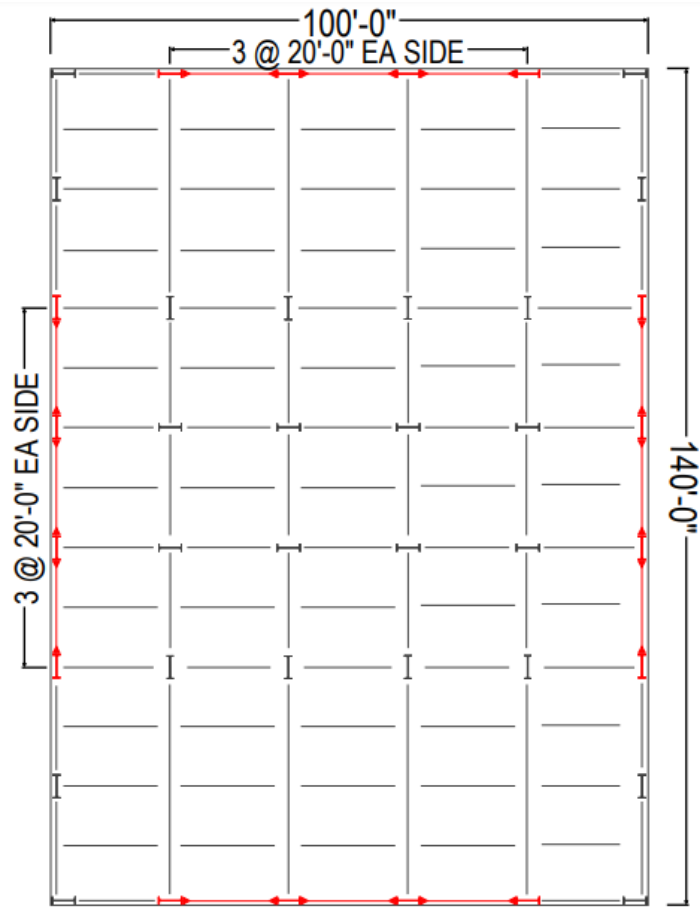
Plan view for 2- and 12-story SMRF buildings
